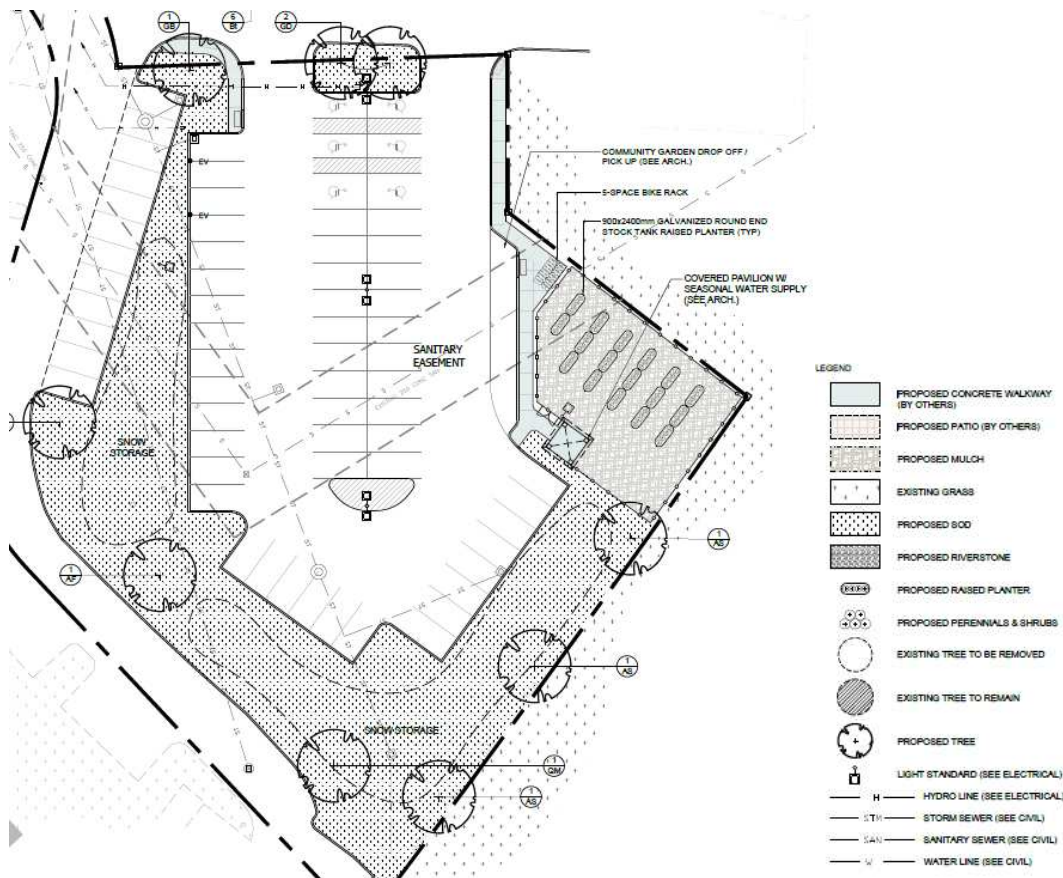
Excerpt from Landscape Site Plan Showing North Section of Site
